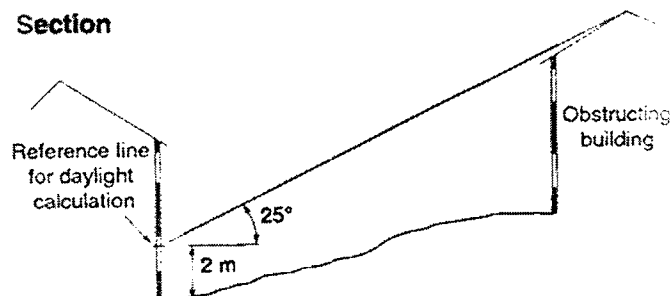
On sloping sites overshadowing is more of a problem and greater spacing is required to obtain the same access to daylight for buildings lower down the slope
